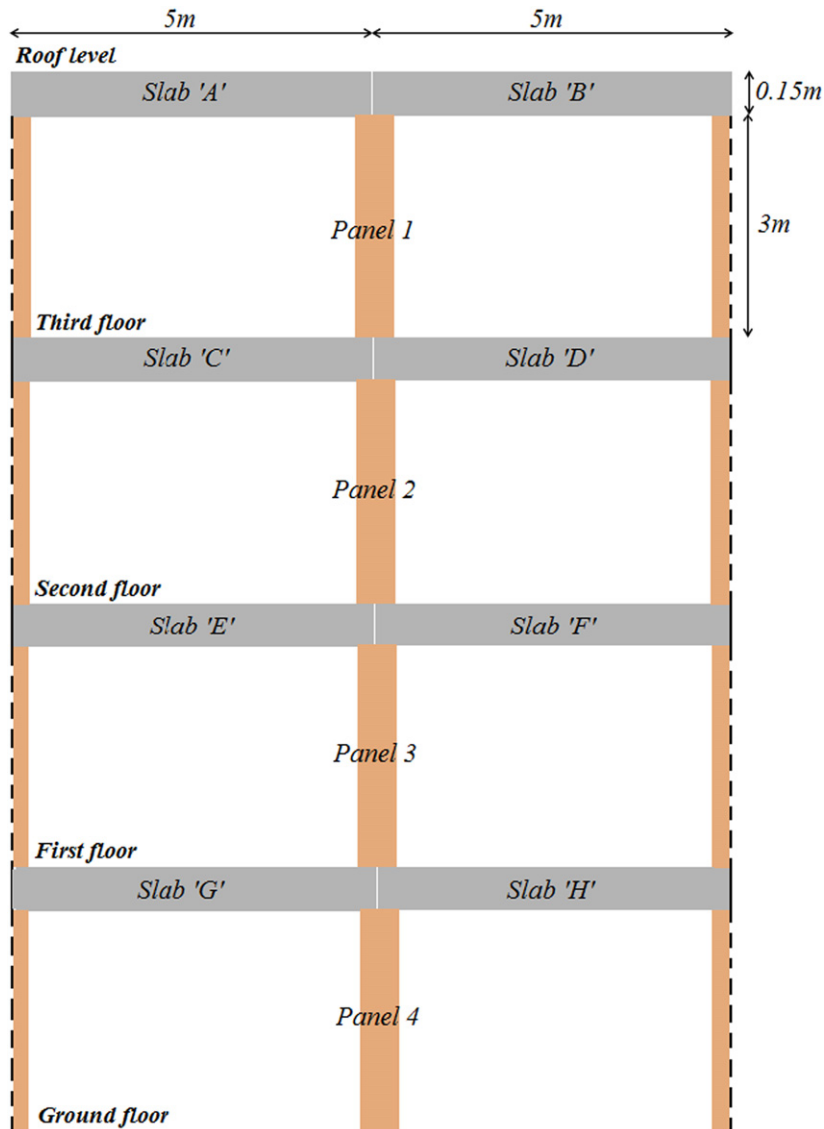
Arrangement of LFC composite wall panels for a four-storey residential building section.
